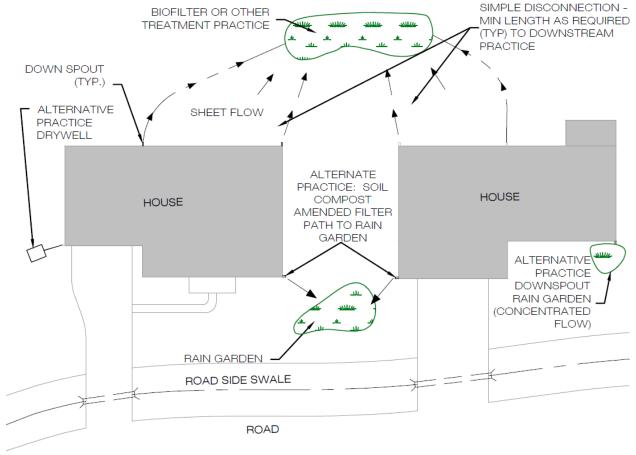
Residential Rooftop Treatment – Plan View: a) Simple Disconnection;
